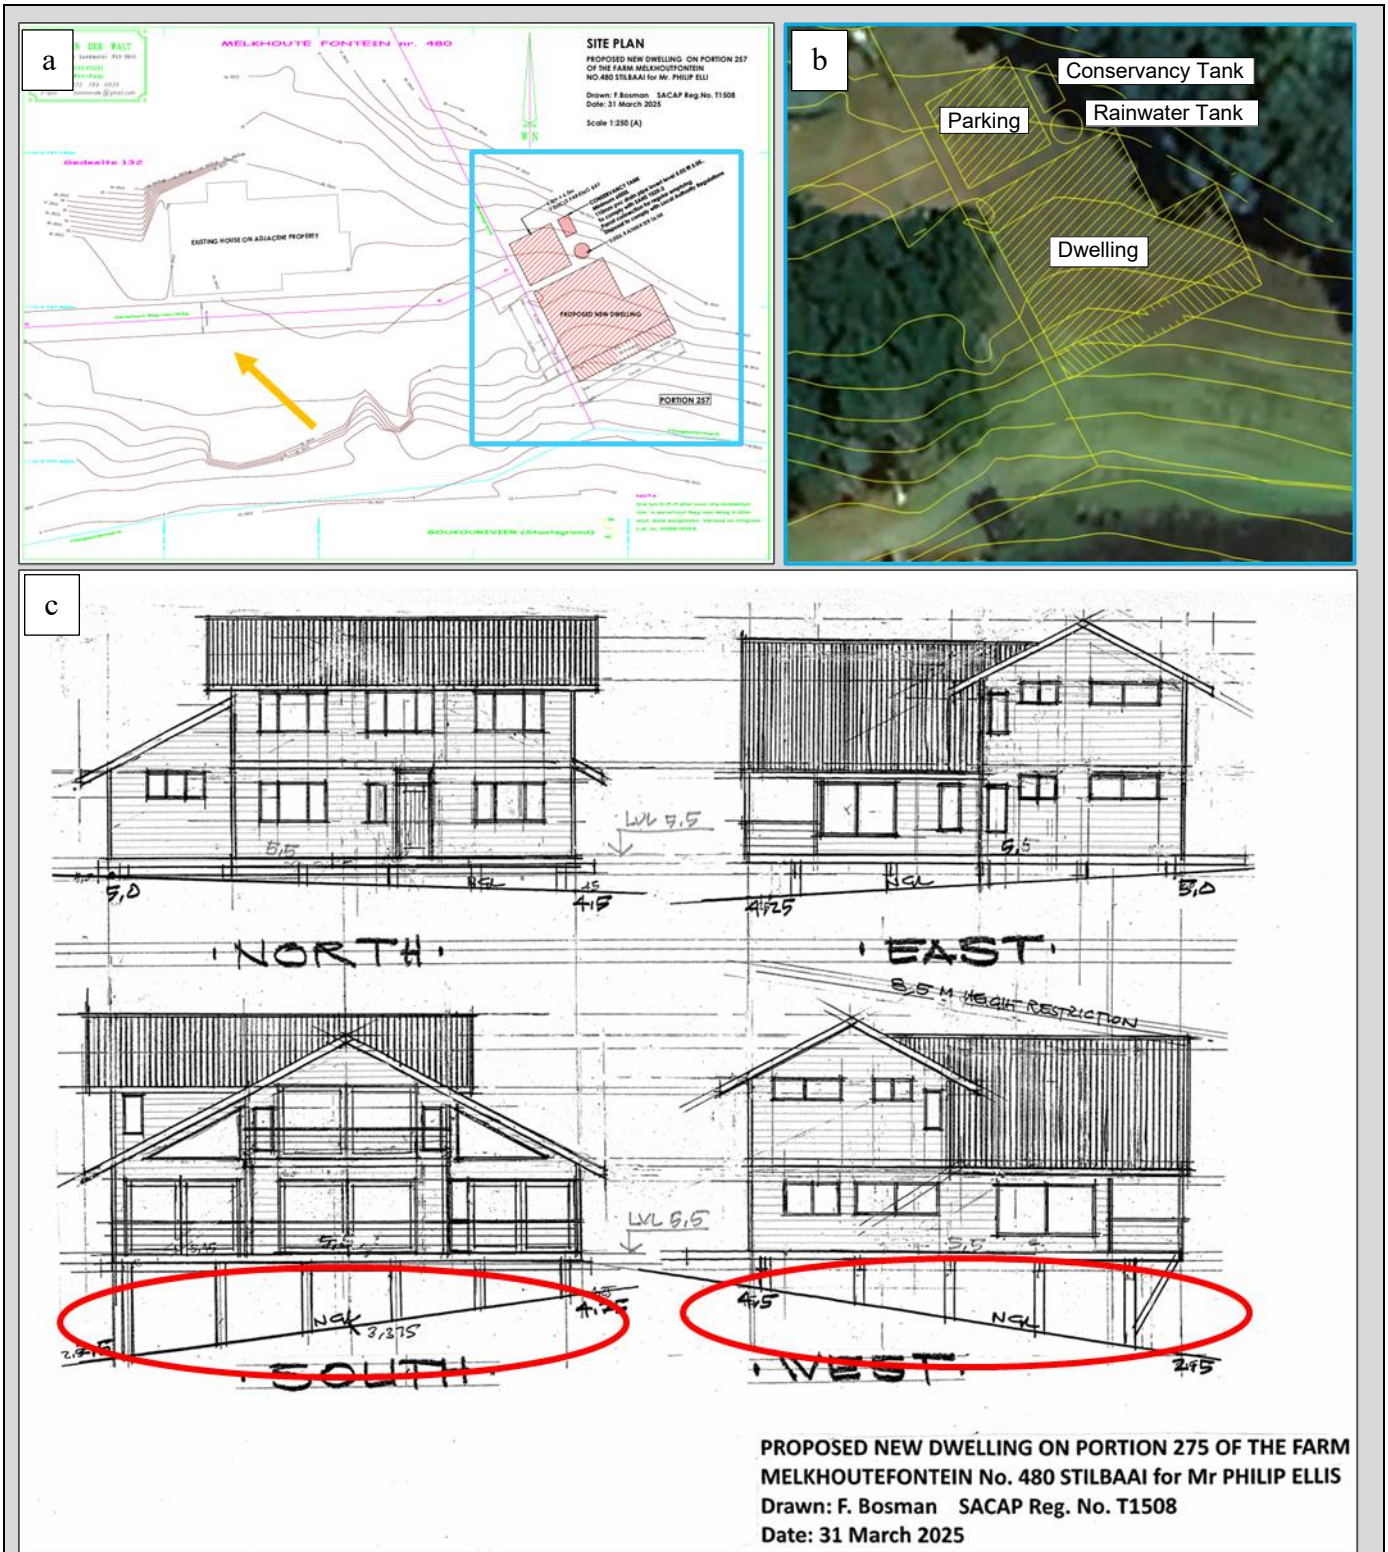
Site Development Plan & Cross-Sections of the proposed Primary Dwelling and associated services infrastructure. (a) The access road on 132/480 is currently in the process of being registered (orange arrow). The development footprint of the primary dwelling and associated services infrastructure amounts to approximately 13m² (blue box) (b) The proposed primary dwelling and associated infrastructure (conservancy tank, rainwater tank & parking) is located on a lawn / grassed area that does not contain any plant or fauna SCC. Although in an Estuarine Functional Zone, the preferred locality does not impact on estuarine habitat (c) The floor level will be at 5.5m above the high-water mark as per the recommendations of WML Coast (red ovals indicate that the house will be on stilts/pillars to be raised above natural ground level).
